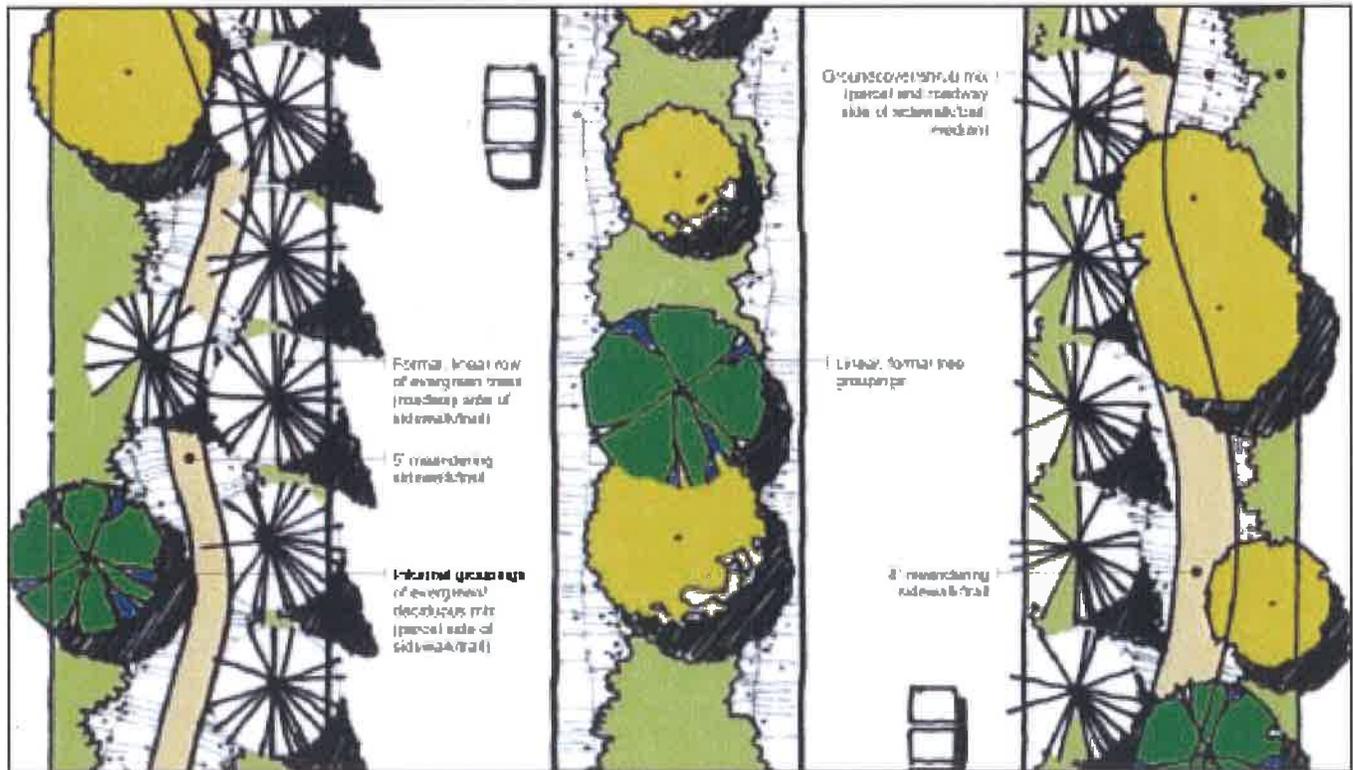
SPARKS BOULEVARD DETAIL
